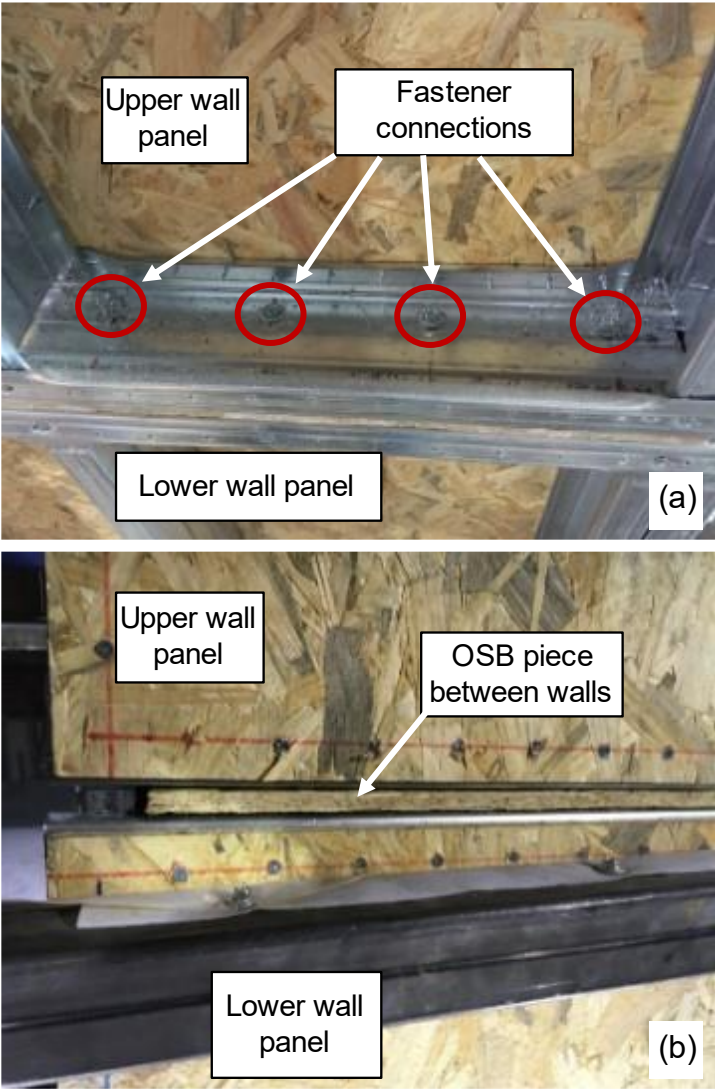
(a) Additional fastener connection between upper and lower shear walls;
